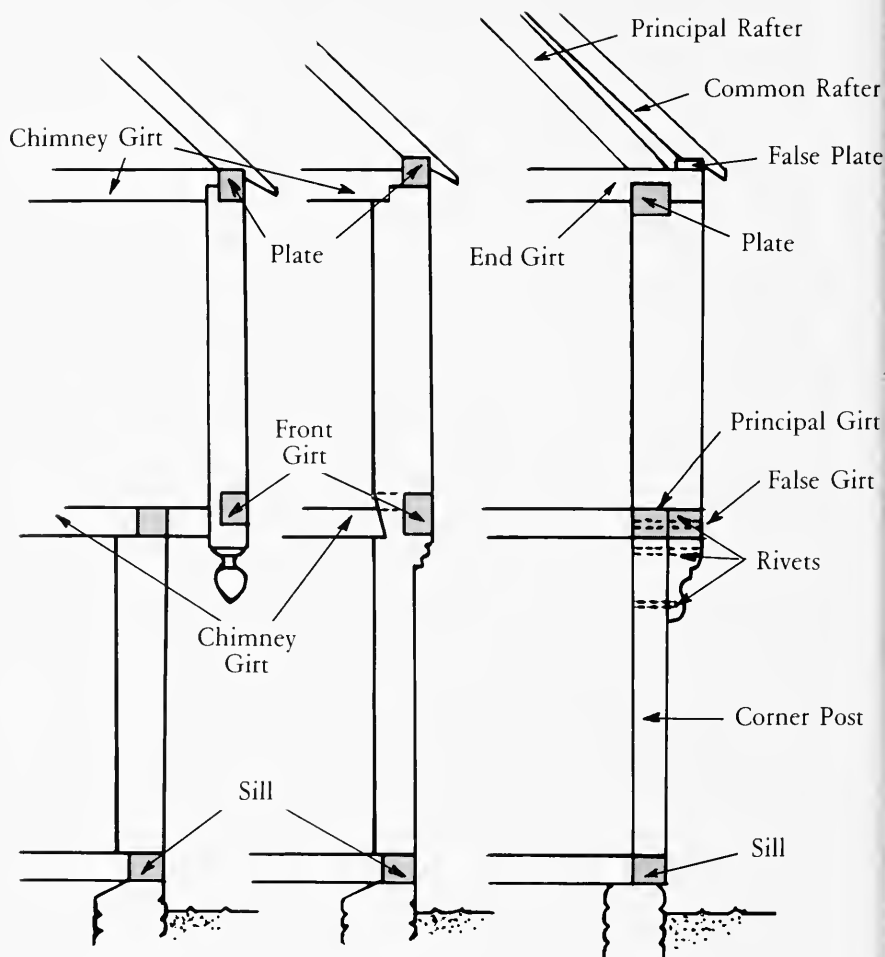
Elevations of framing plans for jettied second stories. Left to right: New England, 17th century; New England, 18th century; the Cupola House. Technical art by Ron Rice, with the details of the Cupola House false girt and brackets provided by James Melchor.
